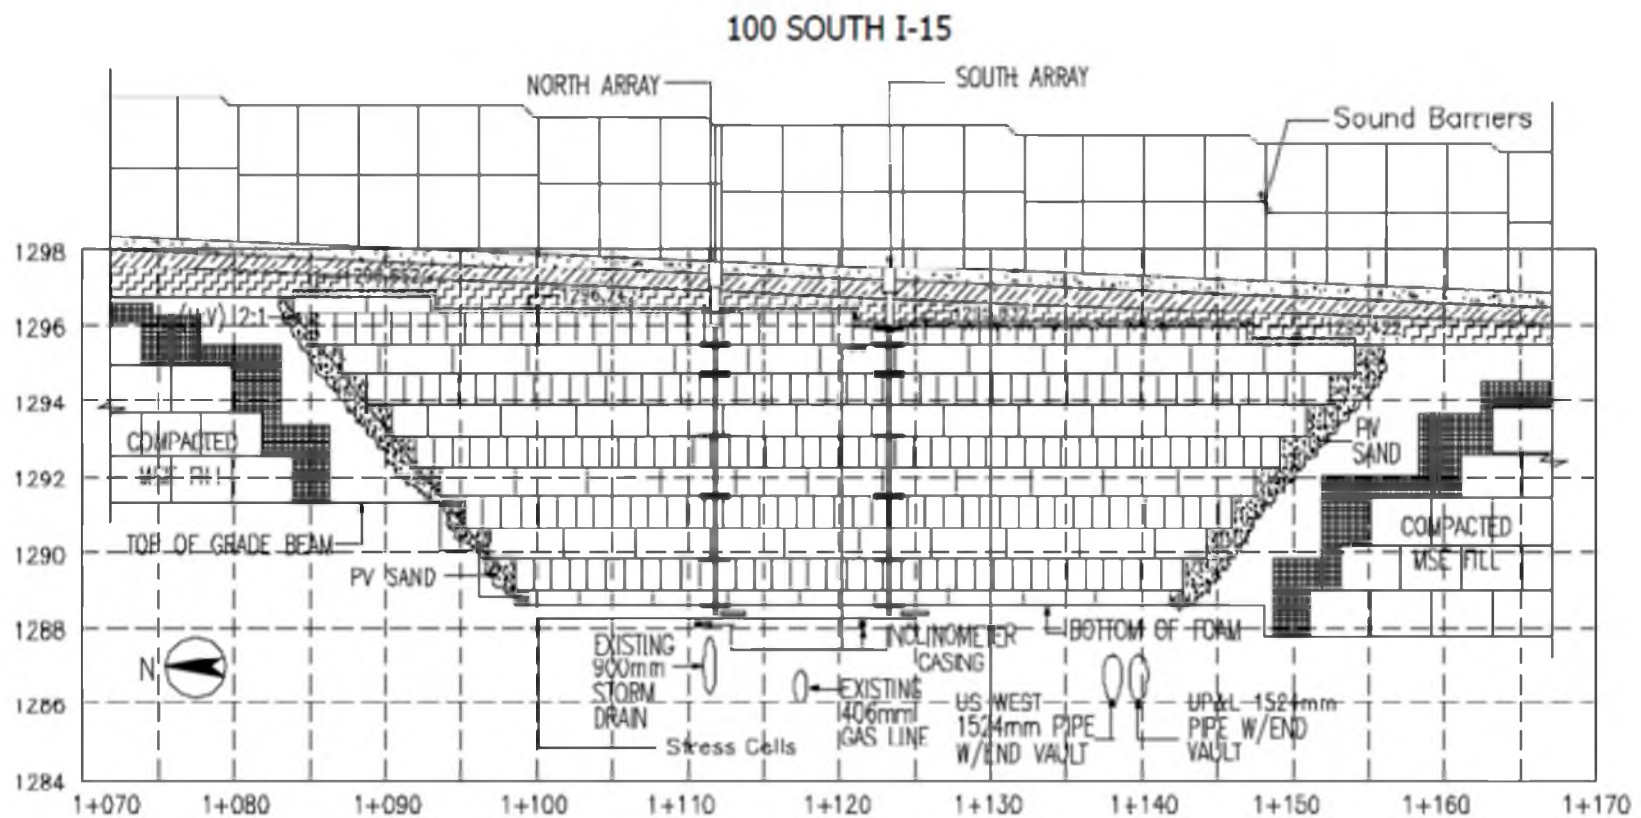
Profile View of the EPS Embankment and Instrumentation
